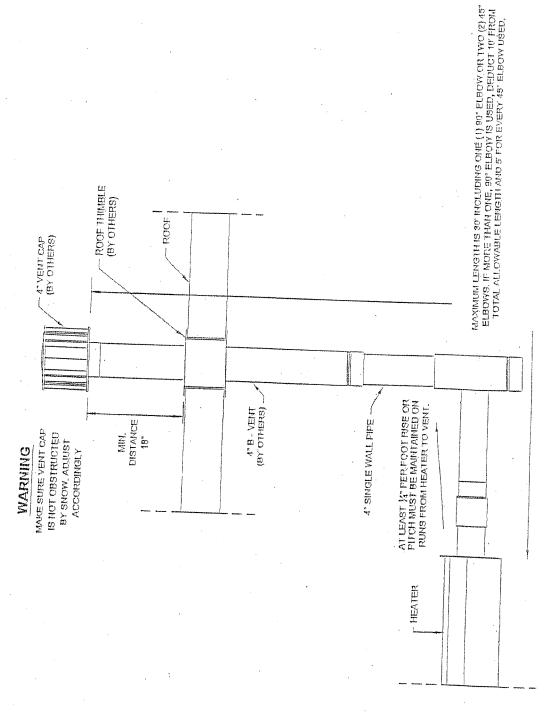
, VERTICAL VENTING, SINGLE UNIT
